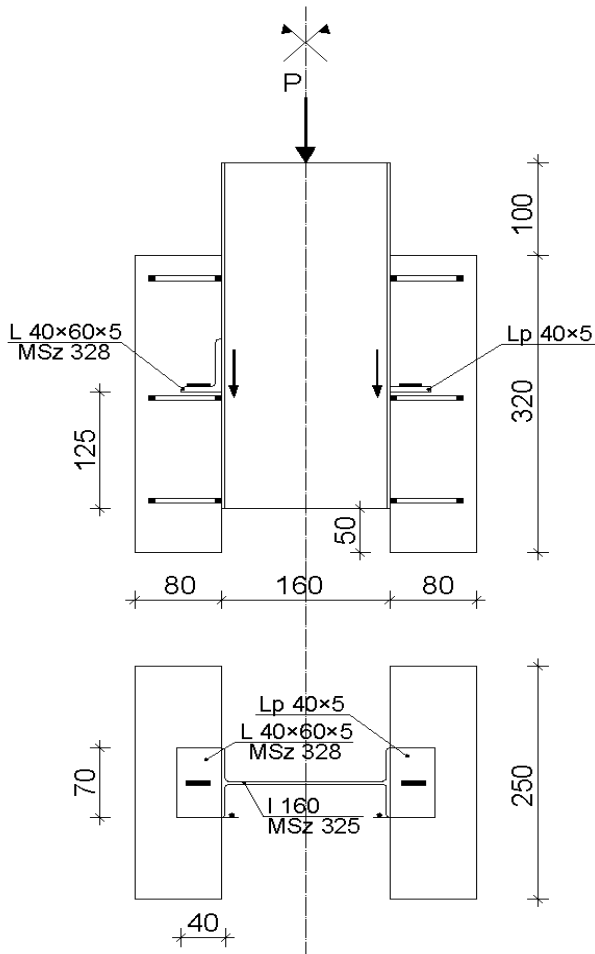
Push-out tests of Specimens S1 and S2, respectively. Measures in millimetres.
